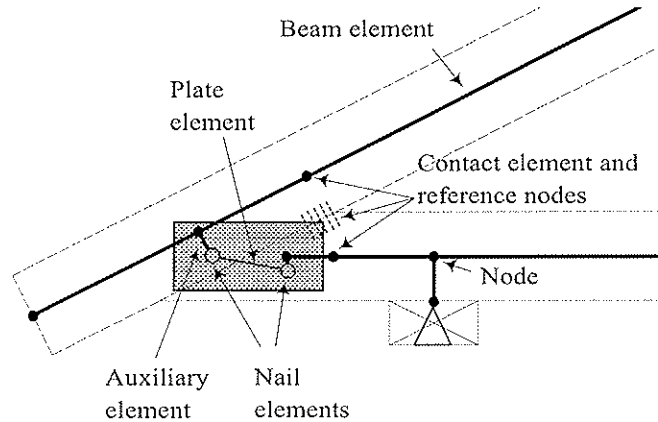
Heel joint used to explain the use of elements in TRUSSLAB.
